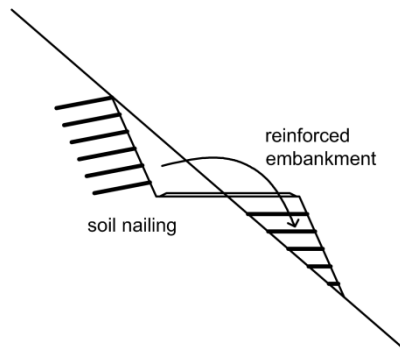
Construction of the road in mountainous area – combination of reinforced soil embankment and soil nailed cutting
